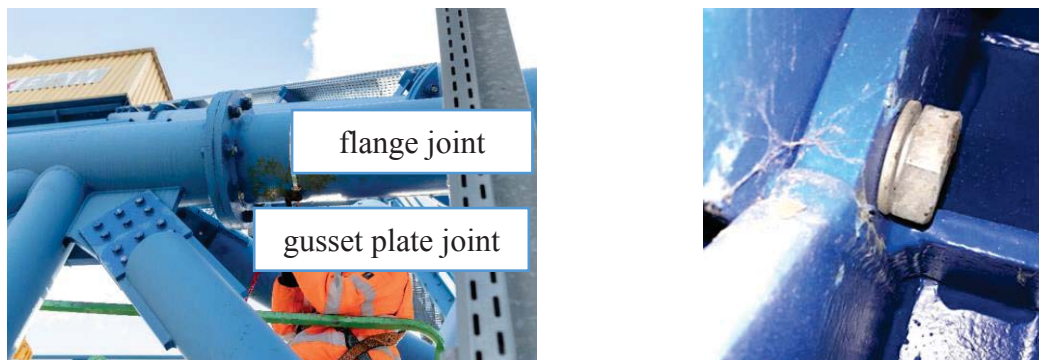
Joints at the tower construction(left) and loosen bolt at one joint (right)
